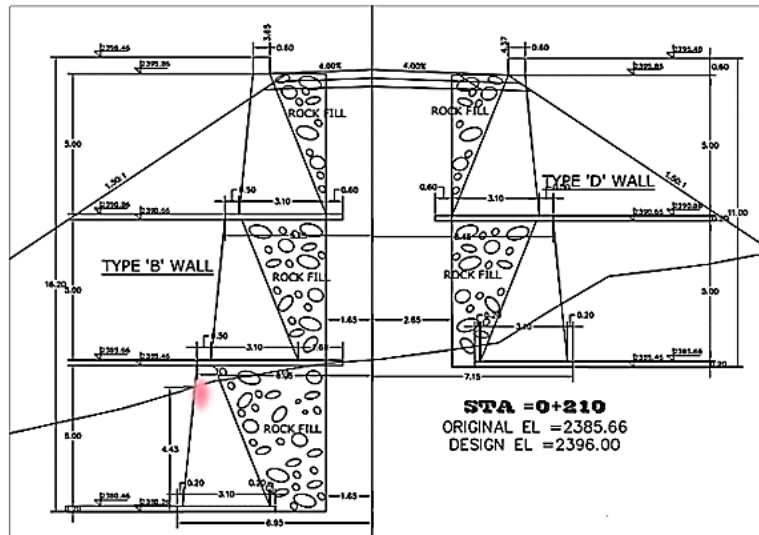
A Cross section of the Retaining Wall at Logita Bridge Site. (Prominent Engineering Solutions, 2018)
